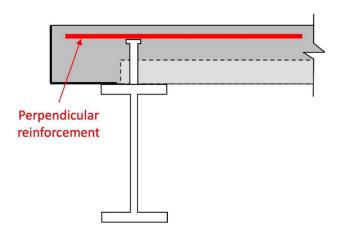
Drawing associated with Question 8 on whether additional slab reinforcement perpendicular to the slab is typically used.
